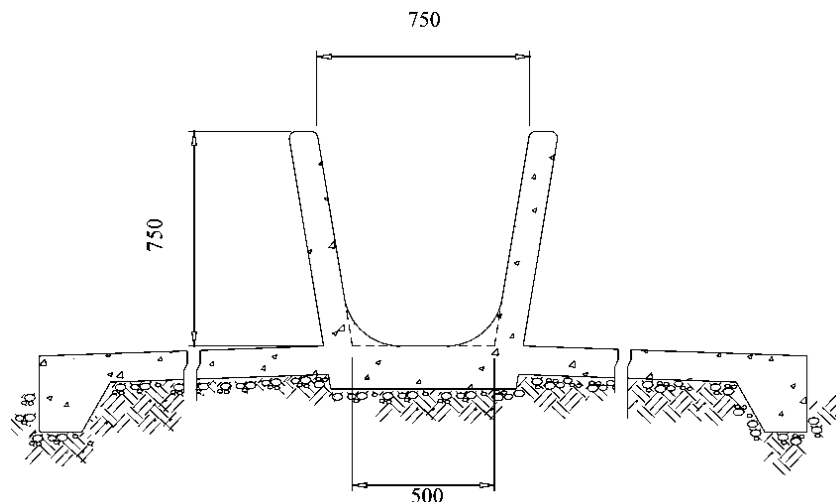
Large Ruminants typical cross section of a water trough, (in mm)
